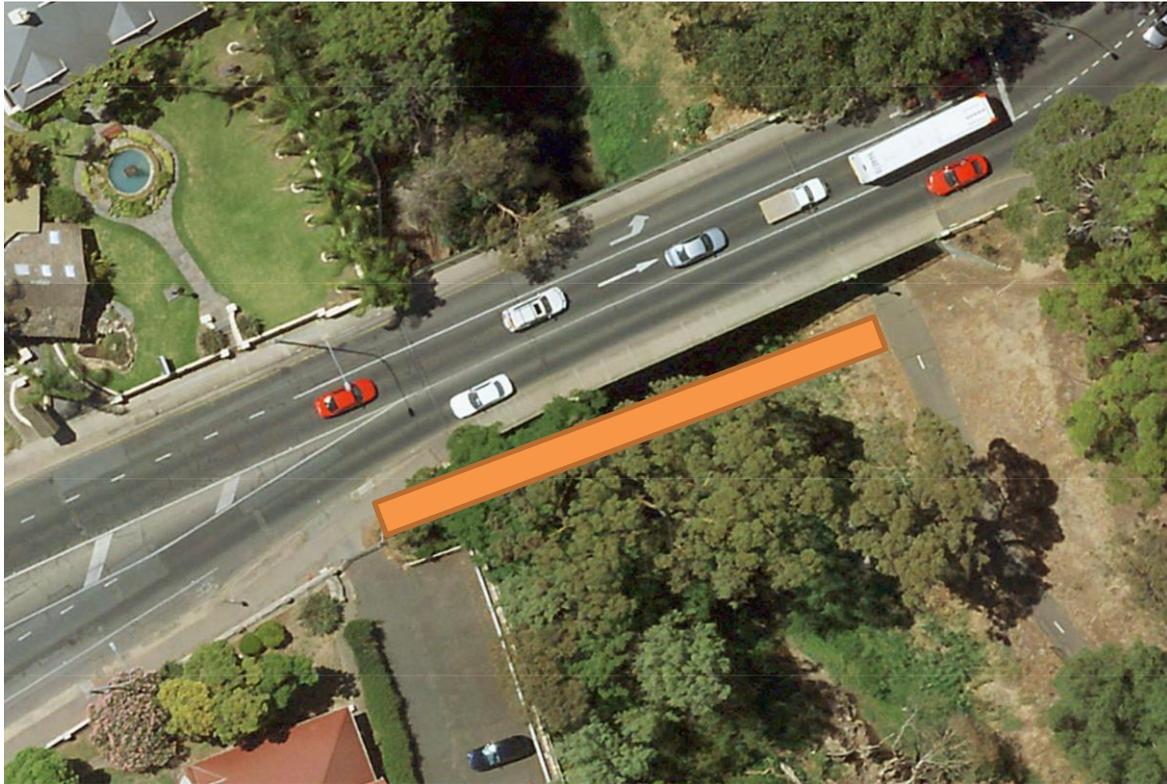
Proposed pedestrian/cyclist bridge adjacent Bridge St South
